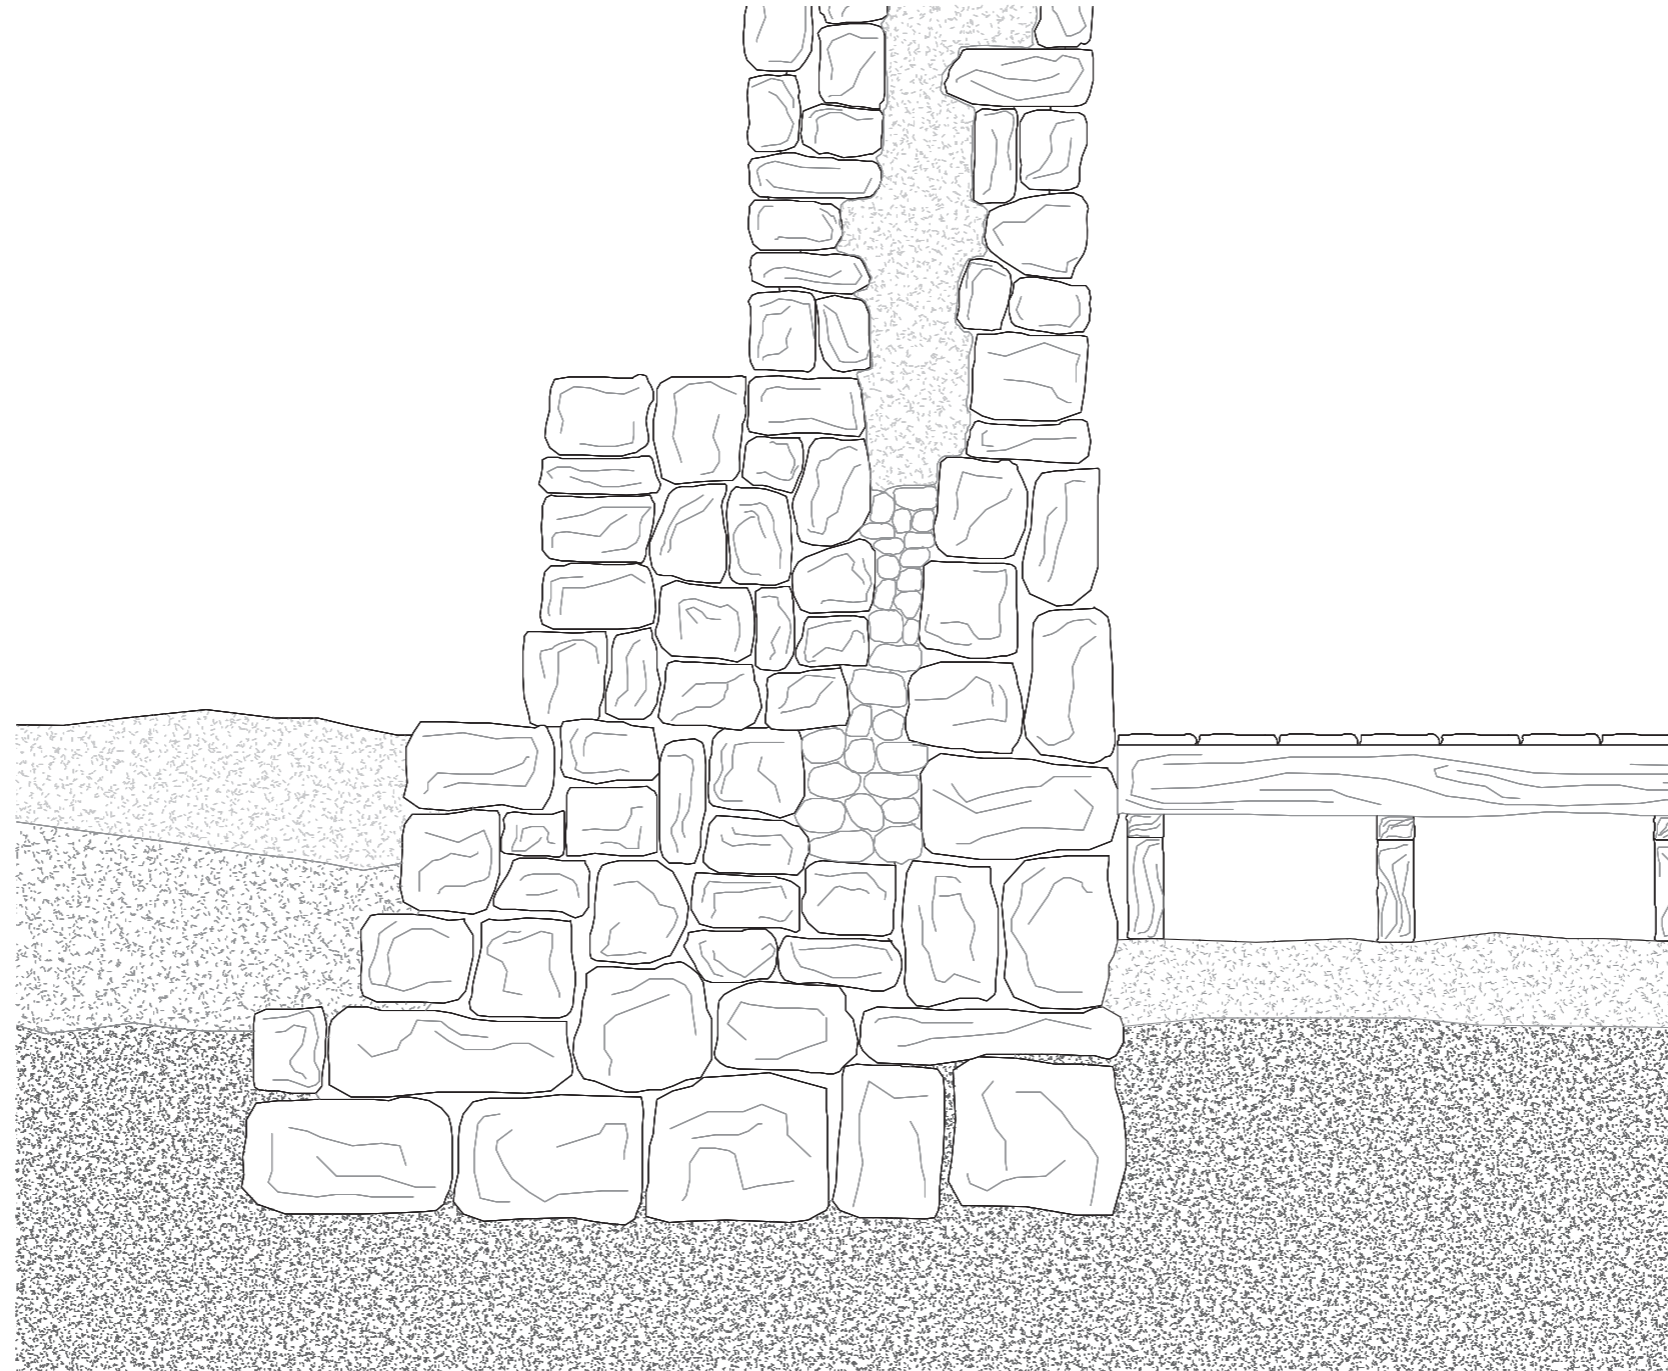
Raised Stepped Stone Footing packed with Small Stones and Sand
